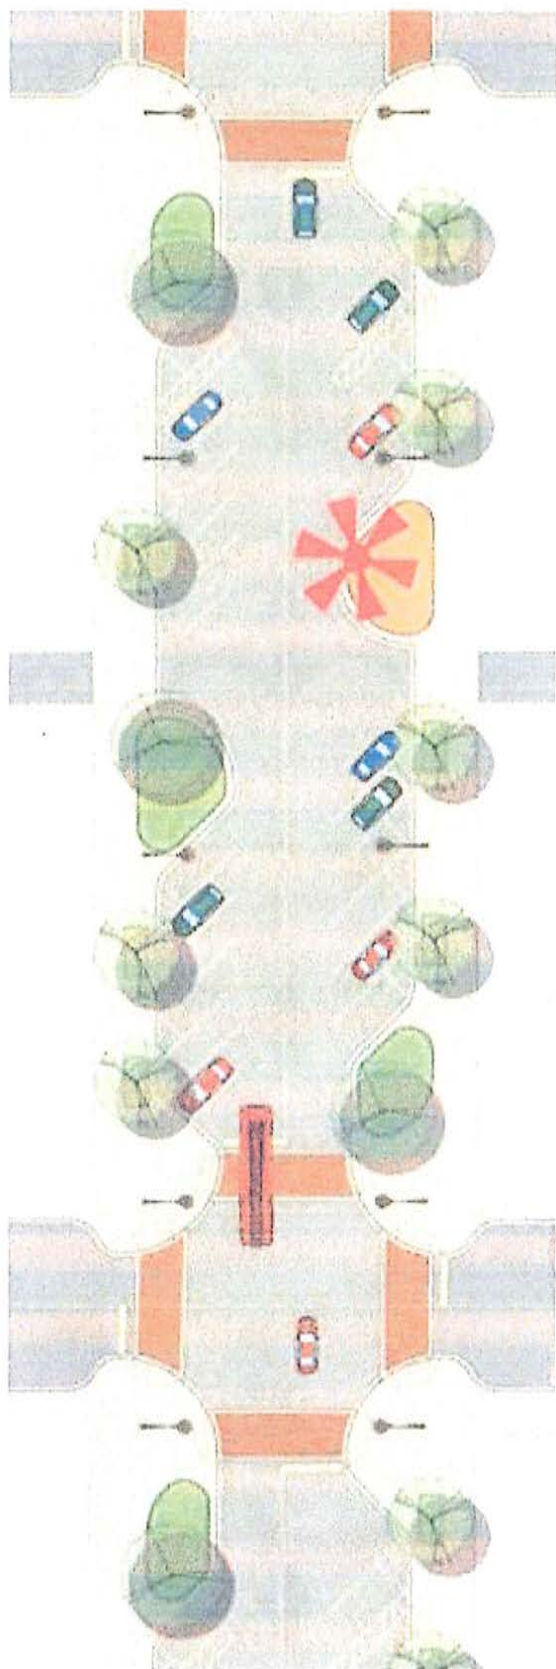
Argyle Streetscape Detail Plan / Perspective
